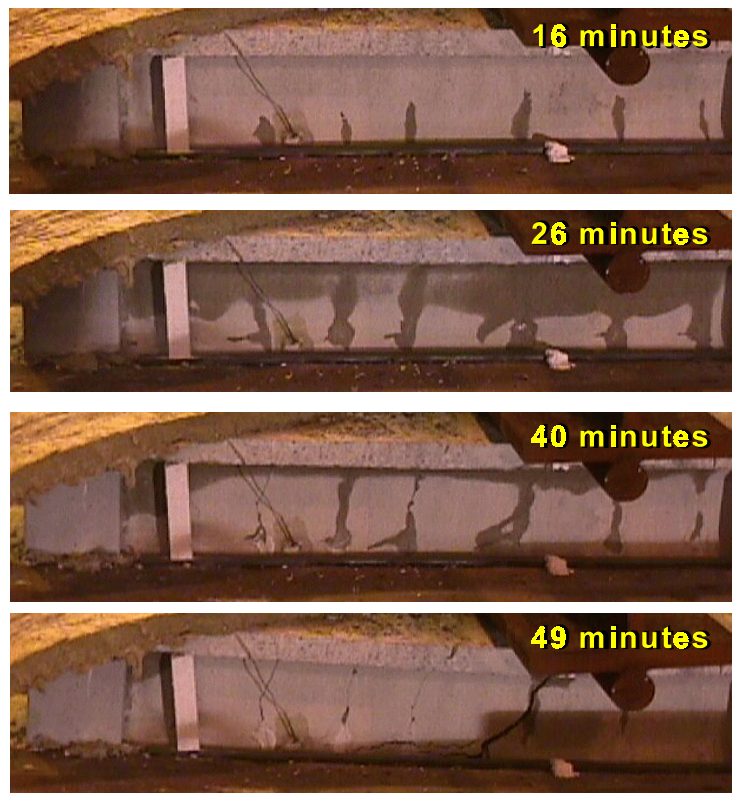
Typical crack pattern in the web of a HVP260 specimen with the strand at 40 mm from the soffit.
